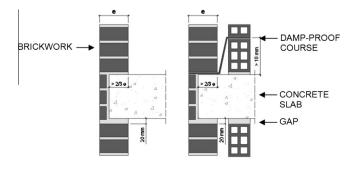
Examples of brickwork exterior walls supported directly on the concrete slab [18].
